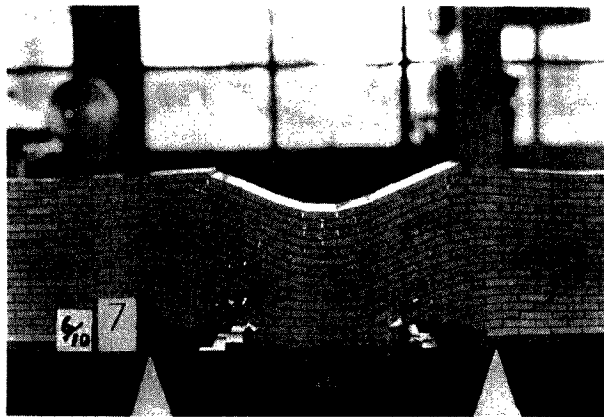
Failure pattern of blocks piled in horizontal strata with symmetrically staggered joint.
